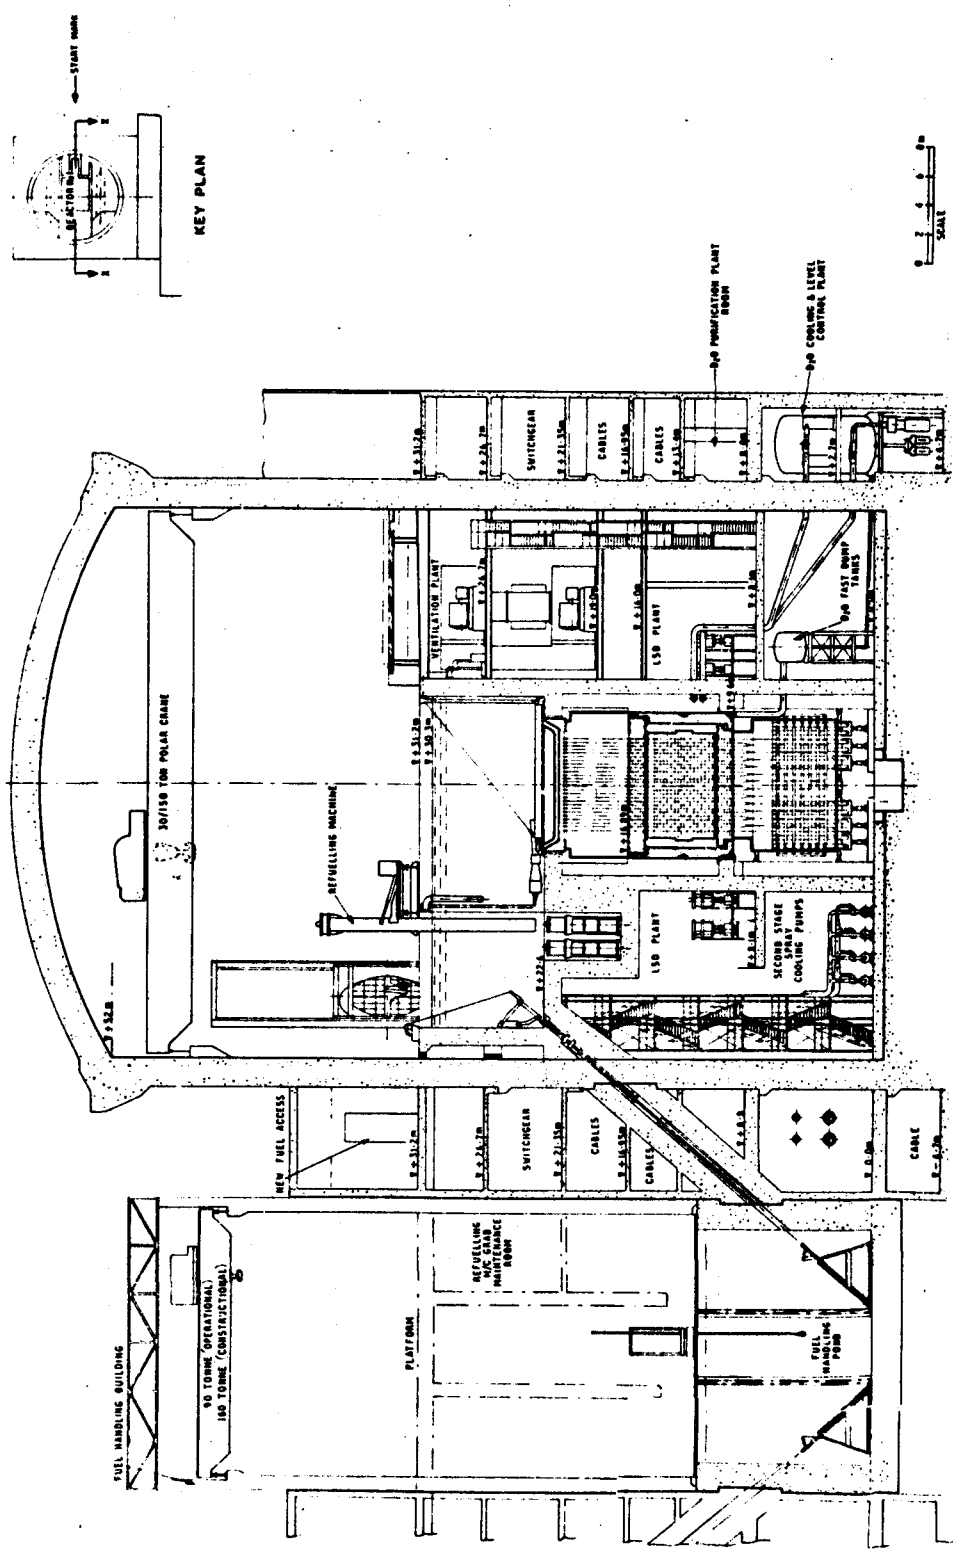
SCHWR BUILDING ELEVATION THROUGH FUEL TRANSFER ROUTE
